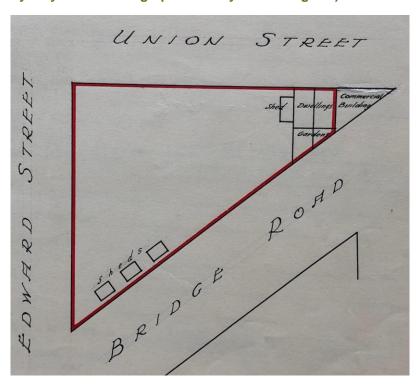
1950 – Sketch plan noting the existing buildings at the site, including three sheds on the Pyrmont Bridge Road frontage, however, this was likely extremely indicative only (Source: City of Sydney Archives, 2866/50, 'Premises, Site bounded by Pyrmont Bridge Rd, Union St & Edward St. M. Fiorelli Pty Ltd – Demolition of two (2) dwellings & sheds & erection of building for use as factory, store & offices.')
